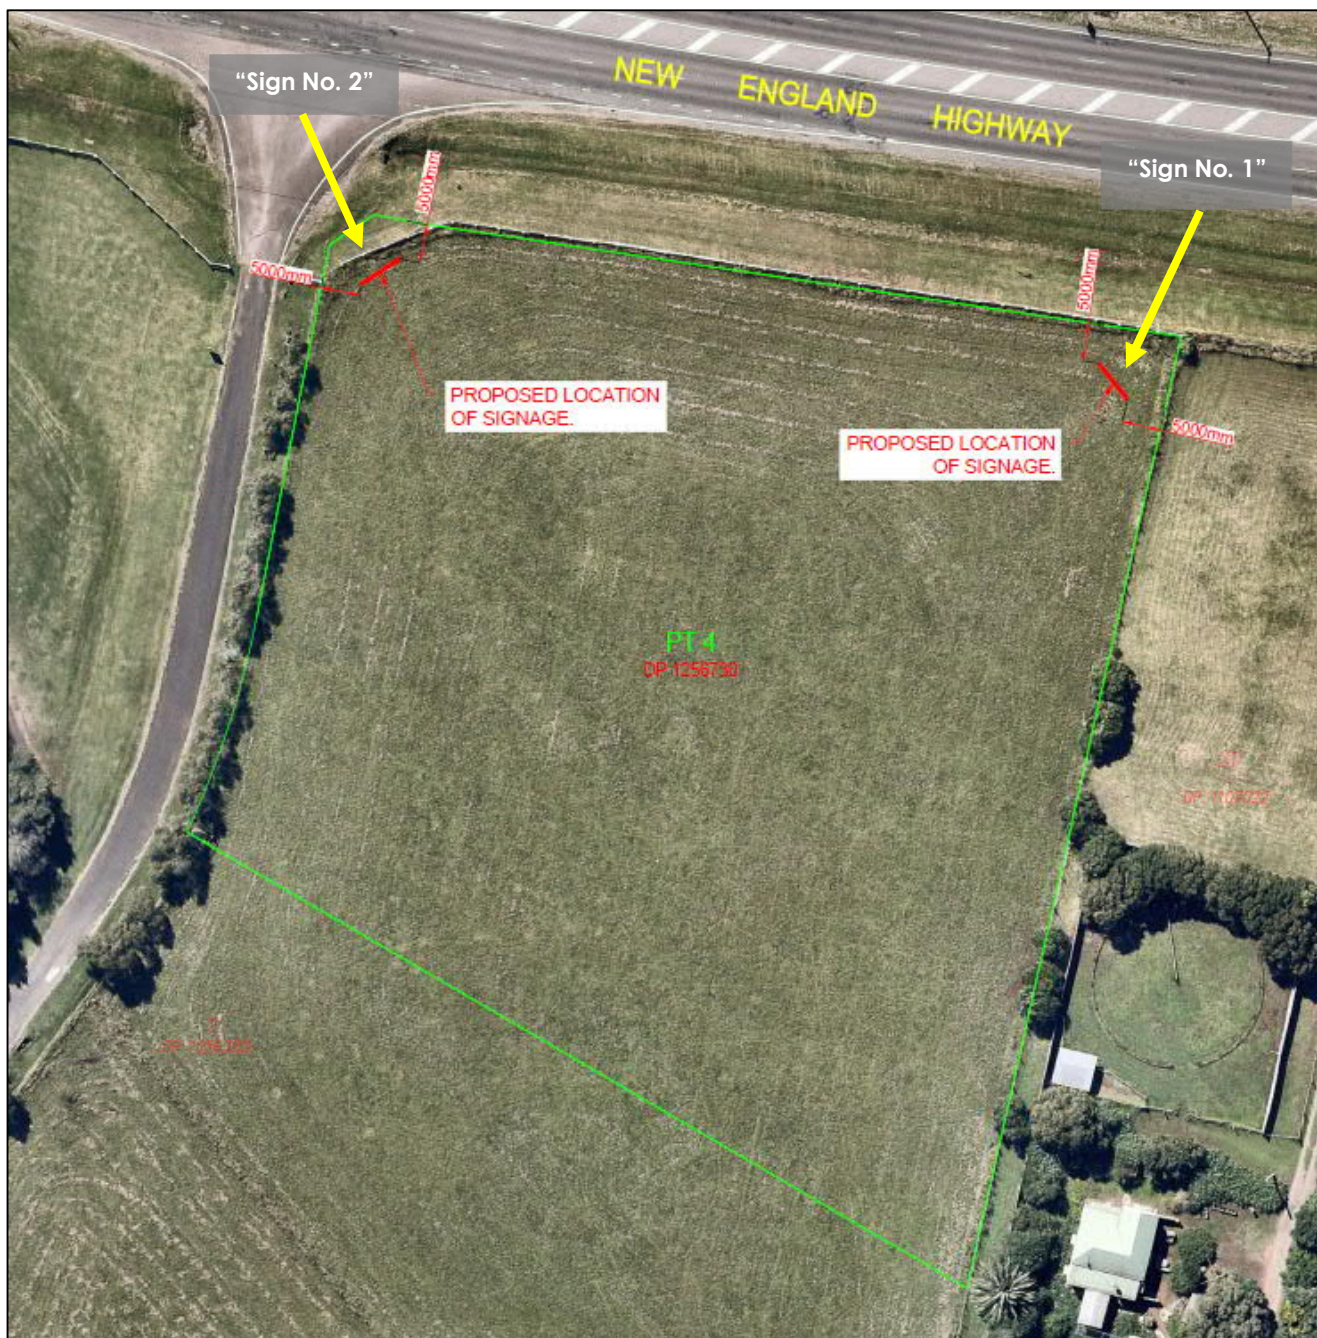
Site Plan and Proposed Location of Signage (BRS; 2021)
